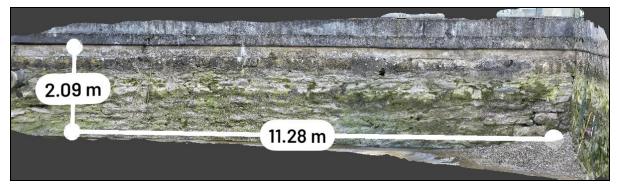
3D-elevation model of masonry quay wall, facing east
